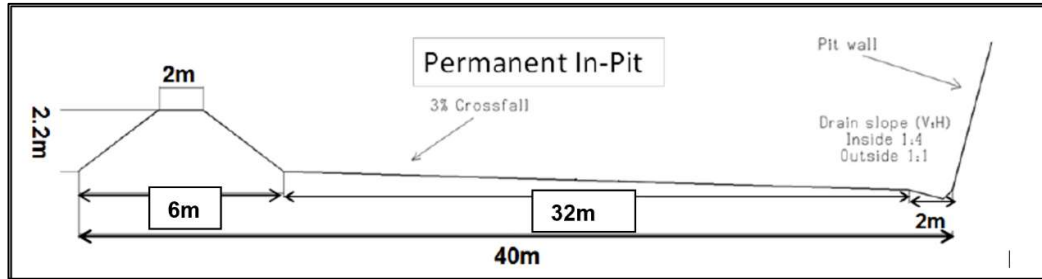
Haul road cross-section (Barrick Lumwana Mine, 2011)
